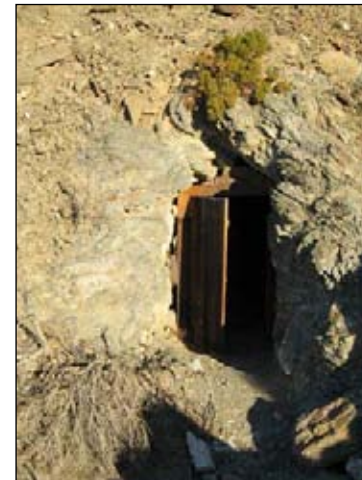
Open adit with wooden portal and door off of Chloride Cliff trail between upper and lower Keane Wonder Mine.
